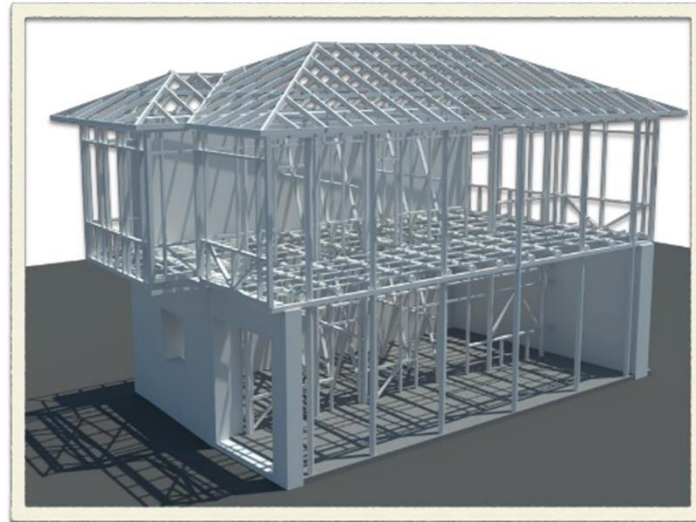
Timber Frame Construction Section (Dr. Erdal COŞKUN,2010)
